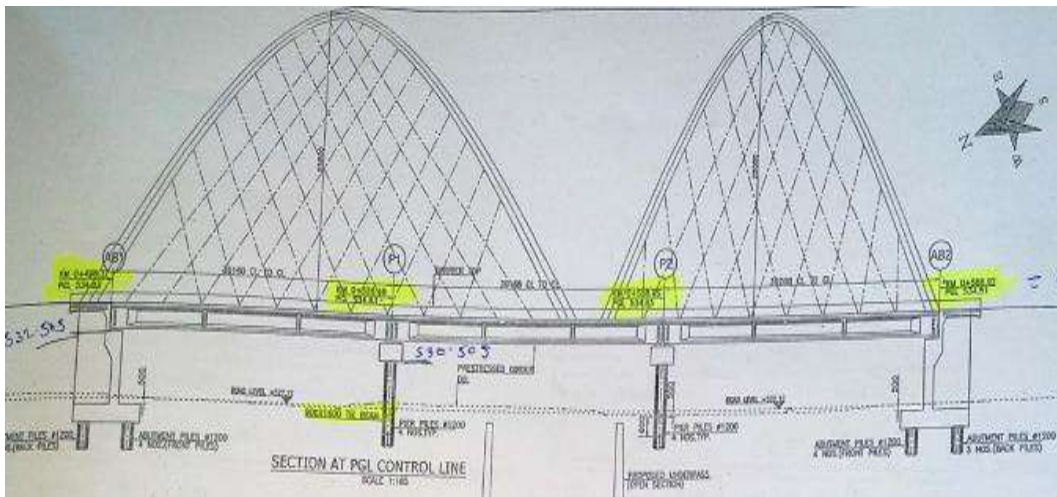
Elevation of Rawal Chowk Bridge
